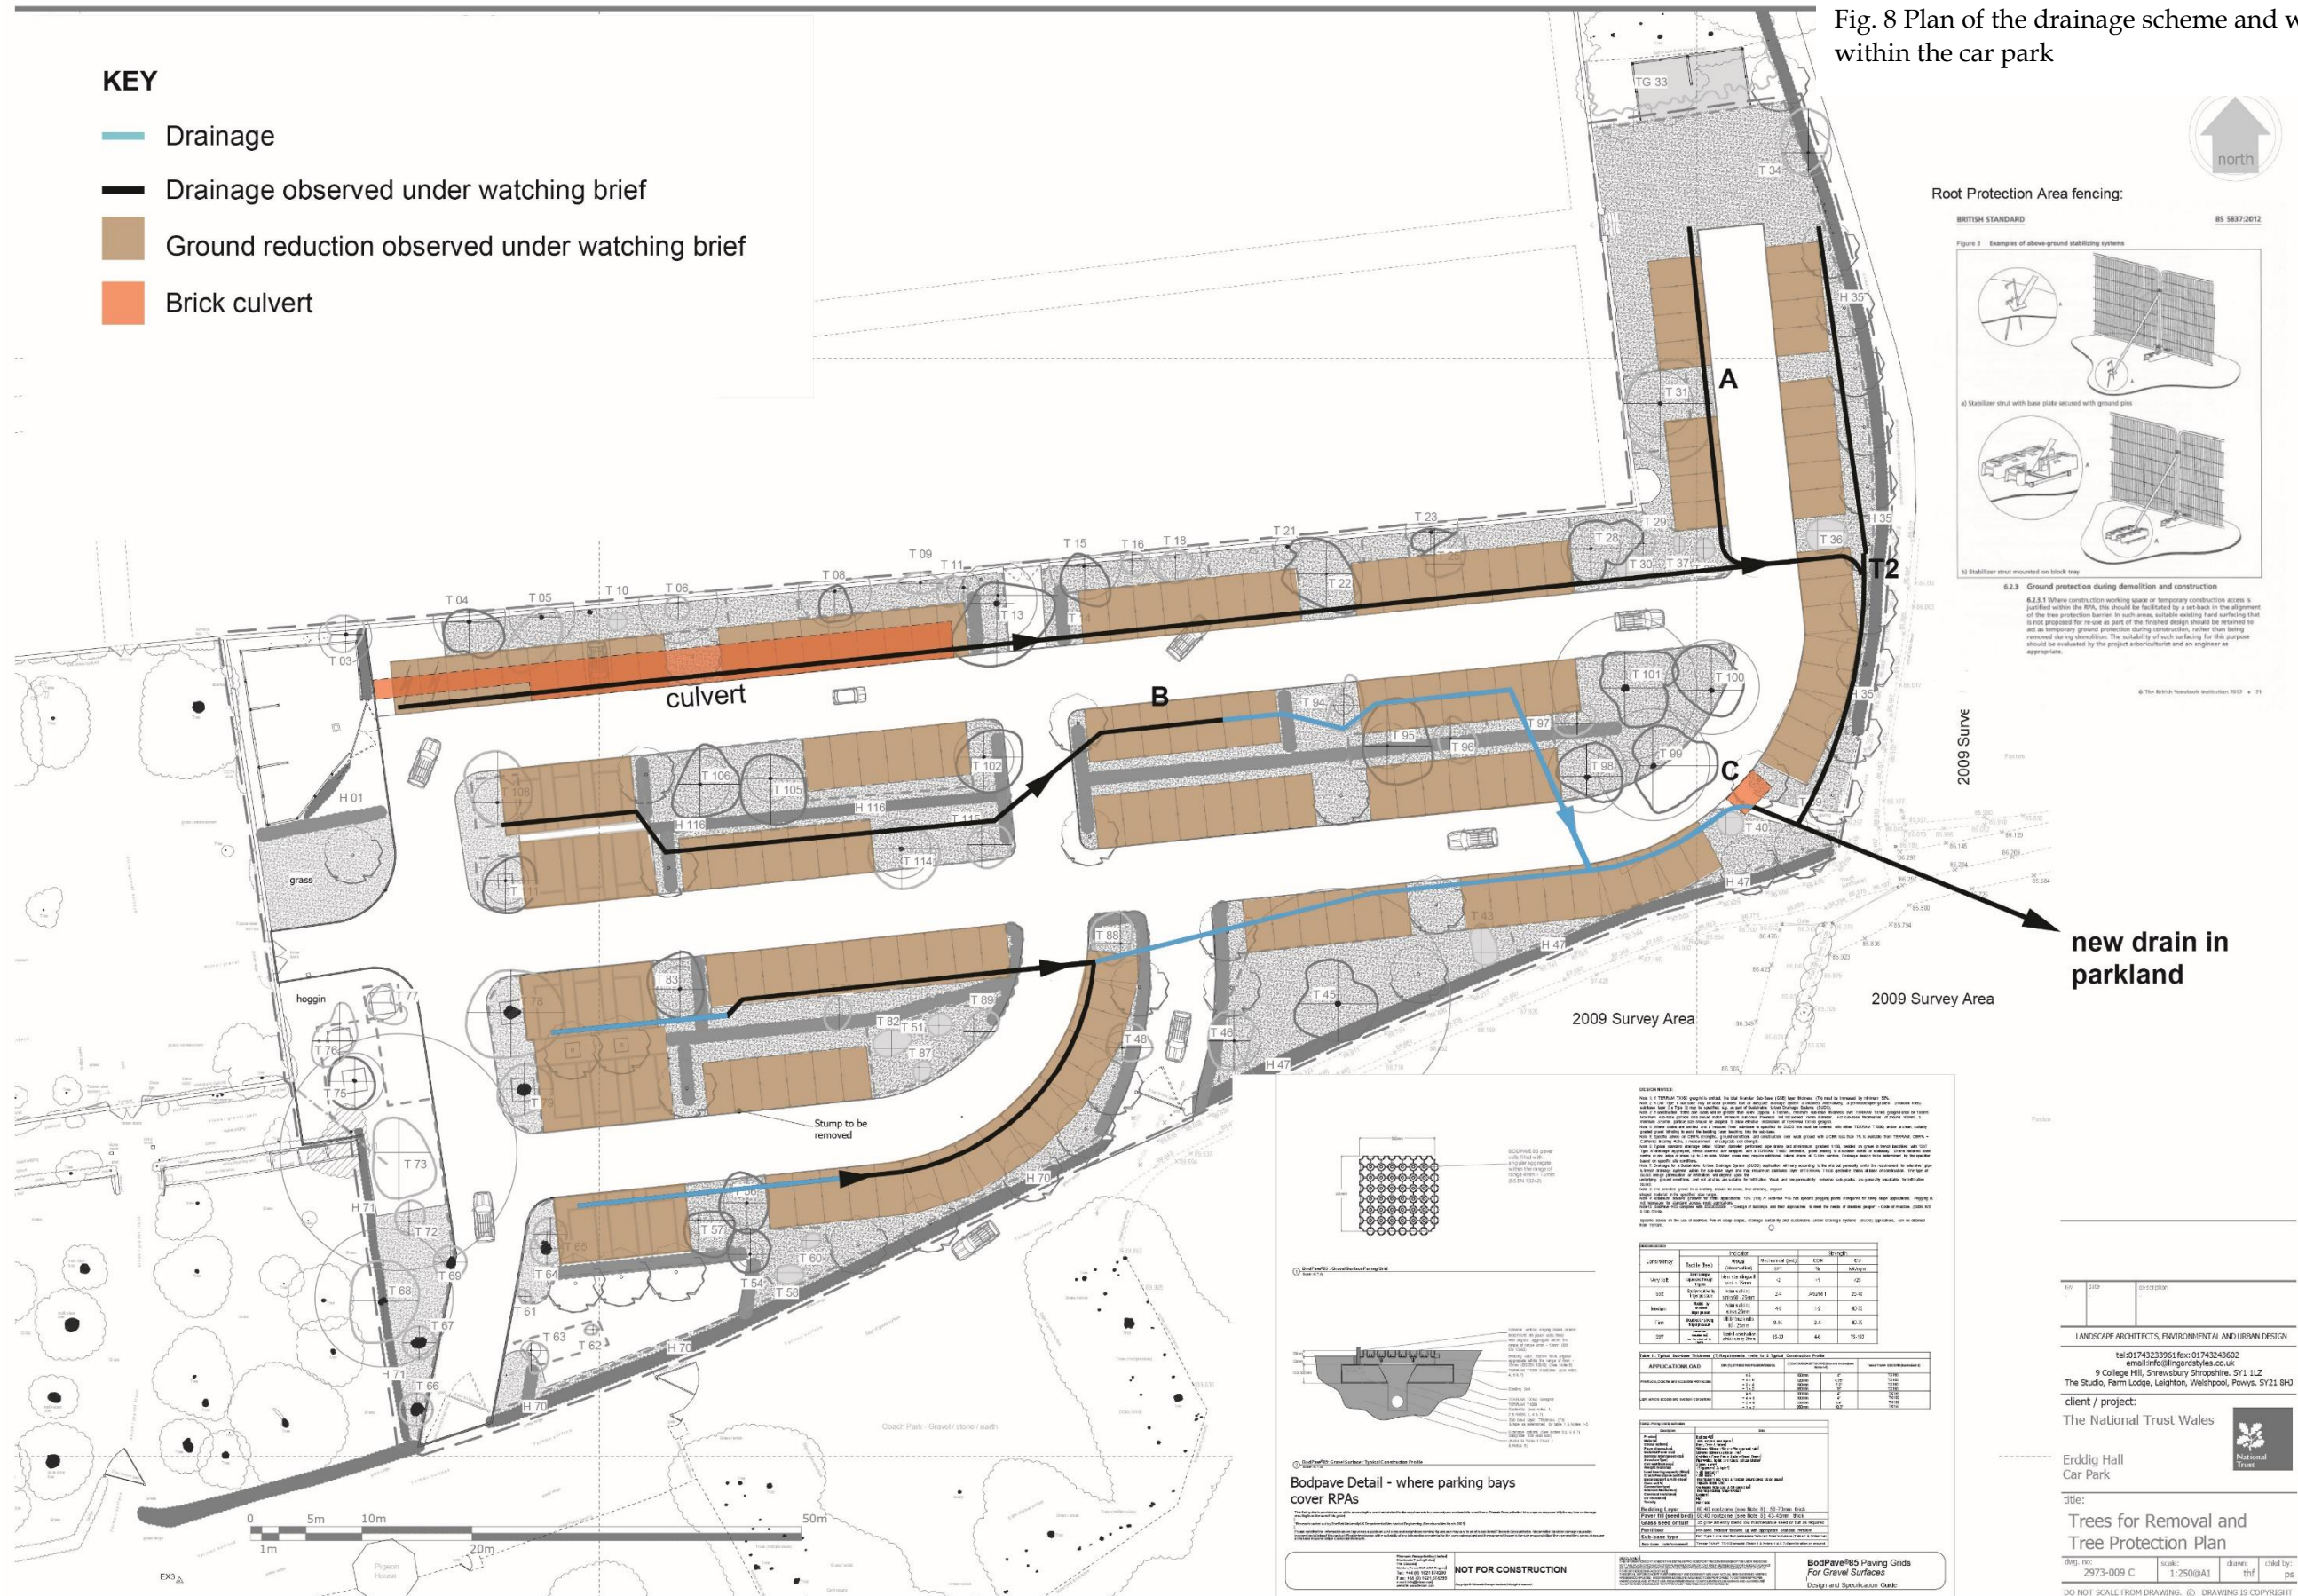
Plan of the drainage scheme and watching brief within the car park
